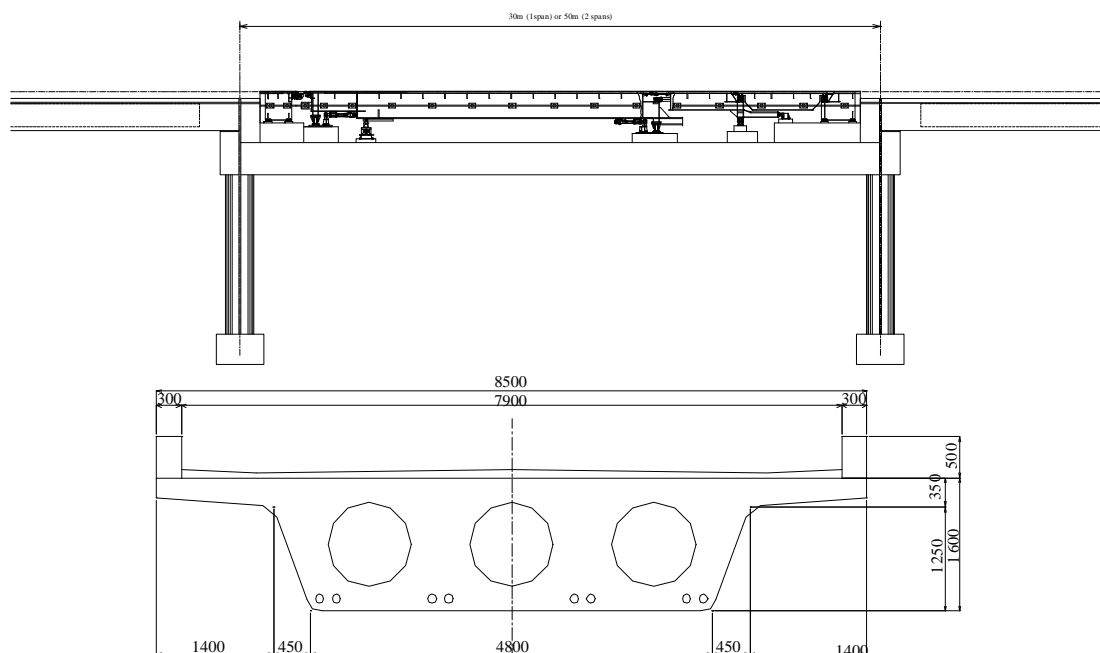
Typical Cross Section of a Monorail Viaduct Portal Type Pier
